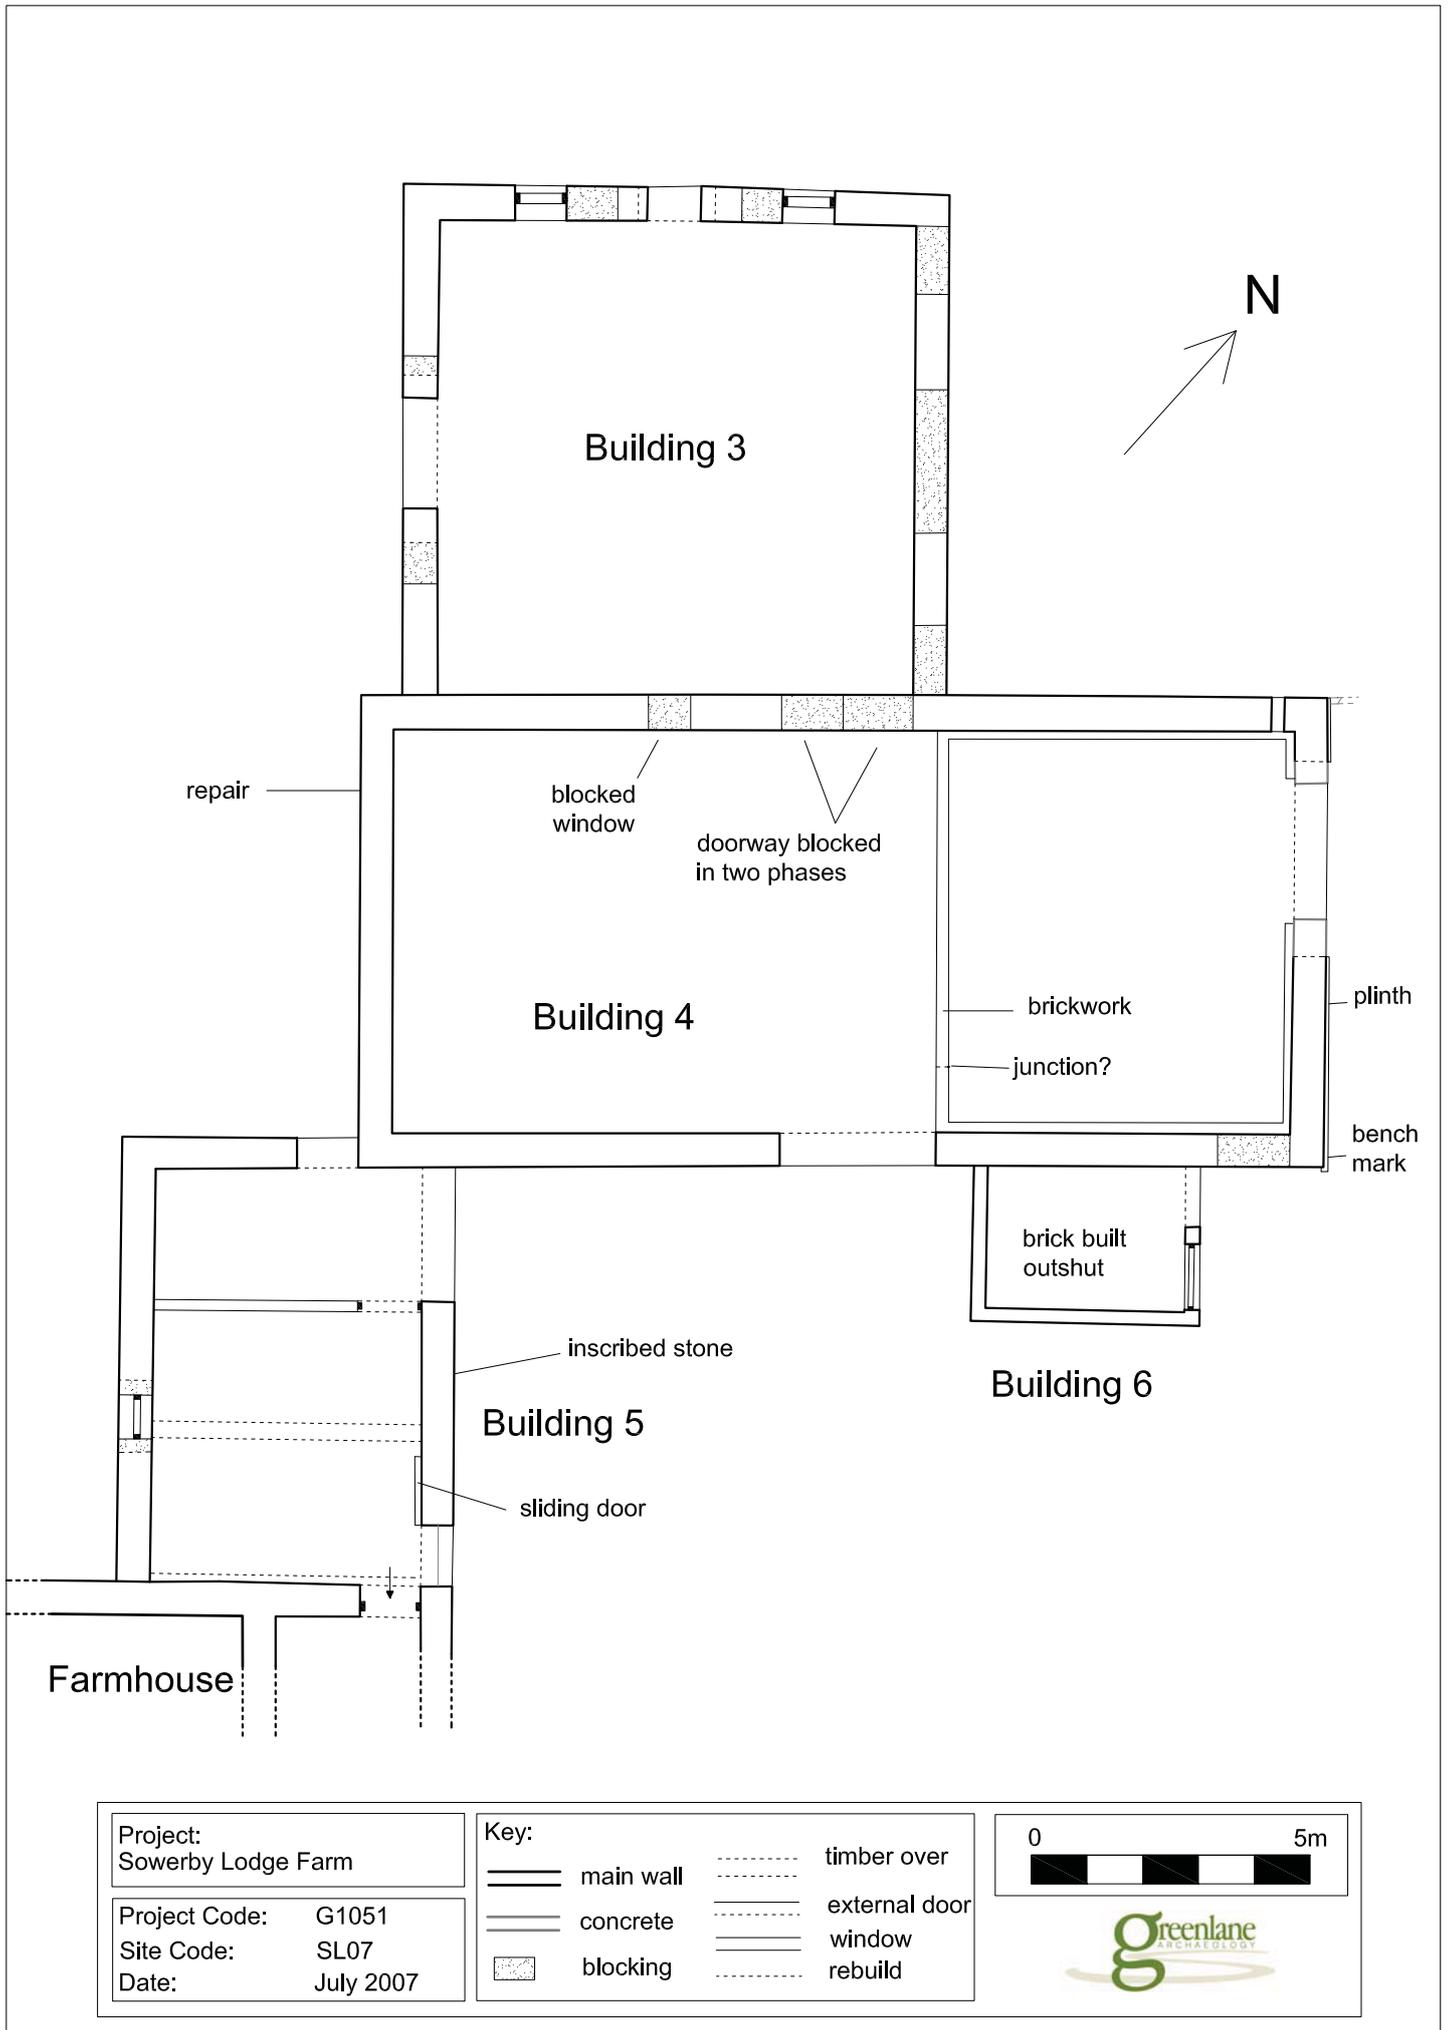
Ground floor plan of Buildings 3, 4, and 5
